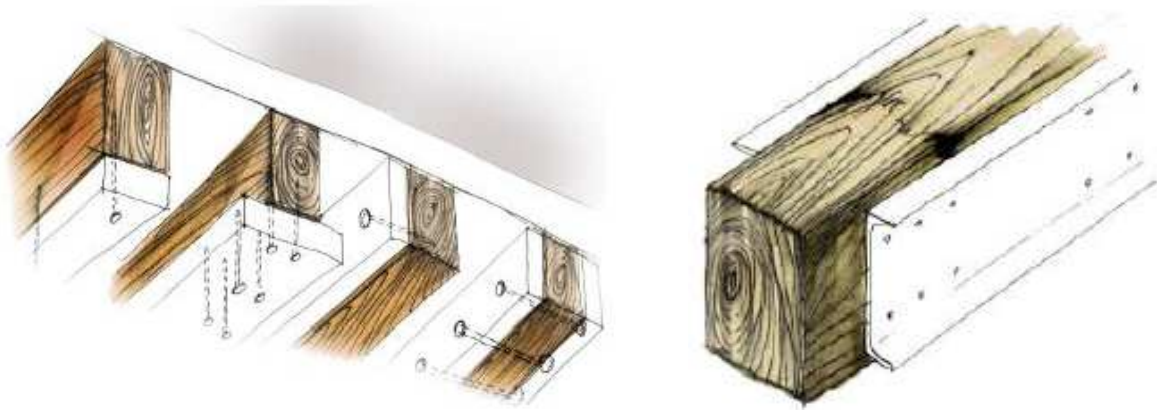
Example of increased cross-section with timber planks (left) and steel elements (right) [14].
